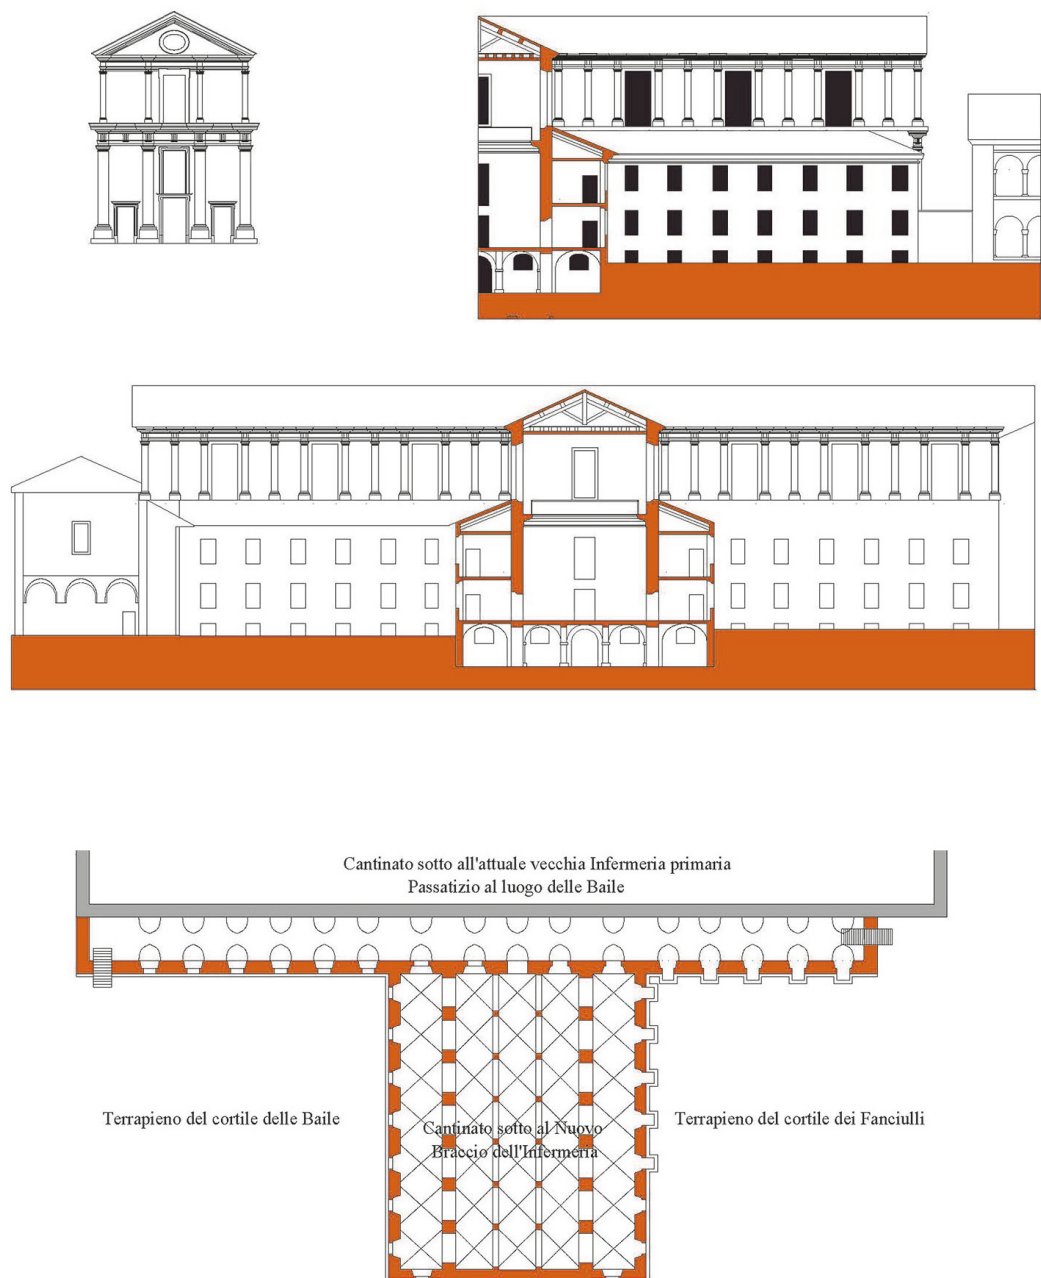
Map of the San Luca Hospital by Antonio Vigliani, 1821, Fourth Wing. Below: plan of the underground level of the New Wing of the Infirmary (Sheet V, basement floor). Above: elevations and sectional-elevations (Sheet VI) (graphic elaborations by M. De Paoli based on the hospital maps 171/175, State Archives of Brescia).
